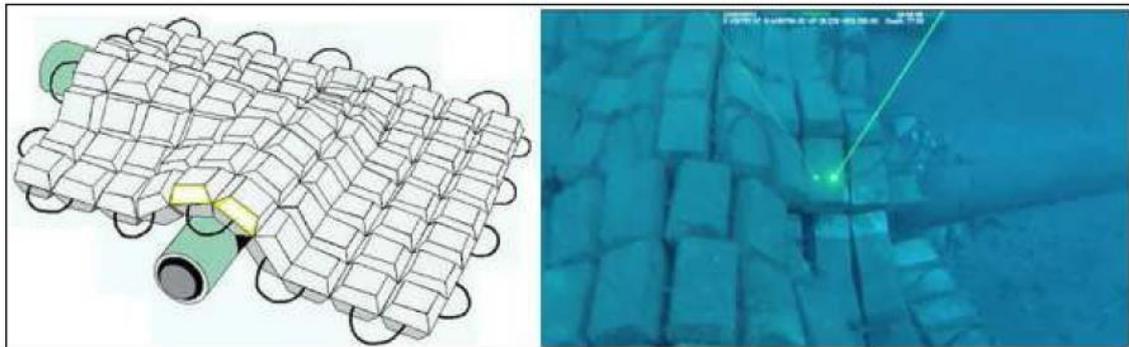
Examples of concrete mattresses for protection of a pipeline
